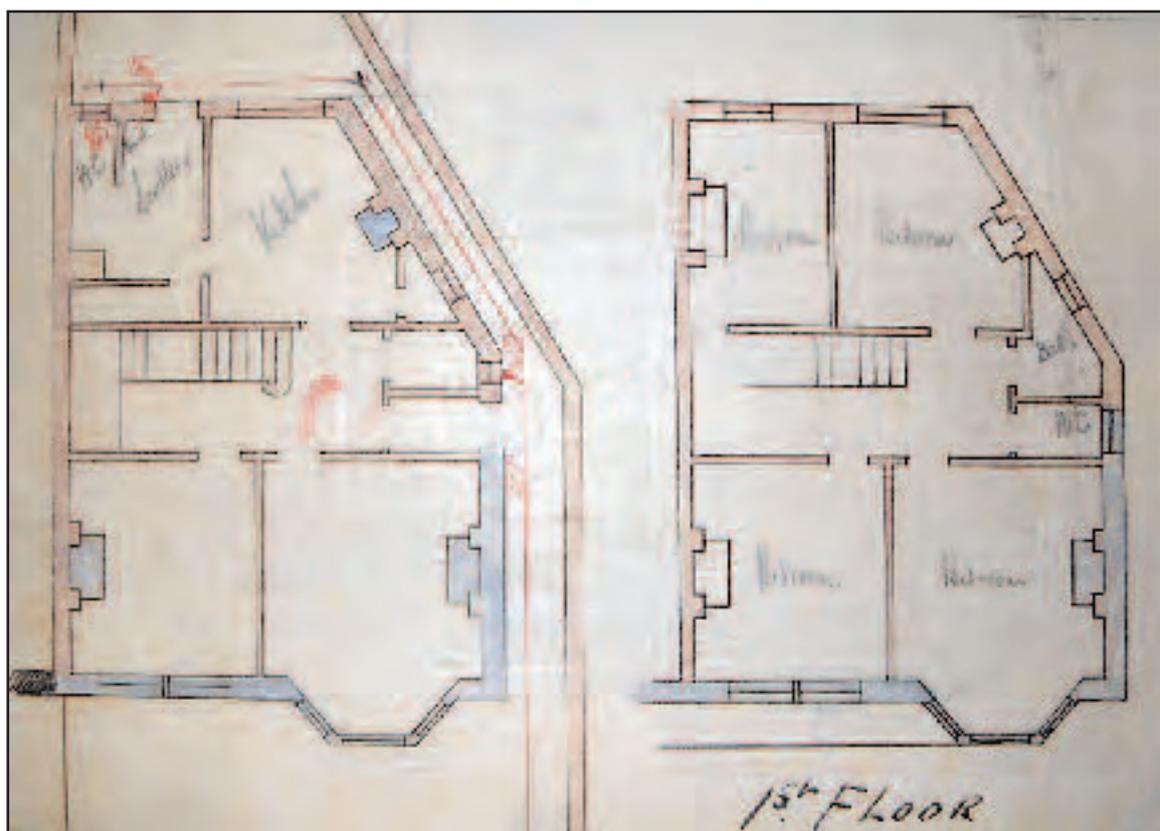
Floor plans, 2 Tyndall Avenue, 1906
